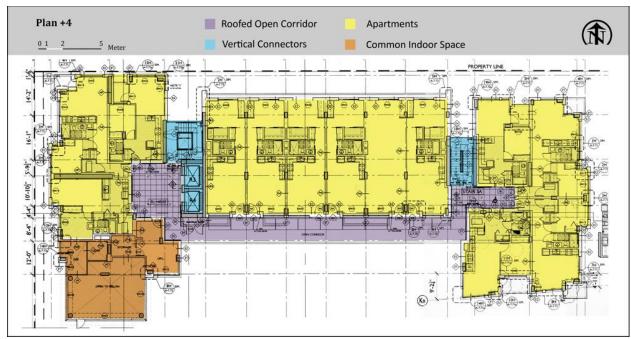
4th Floor Plan The arrangement of the open corridor and other areas
